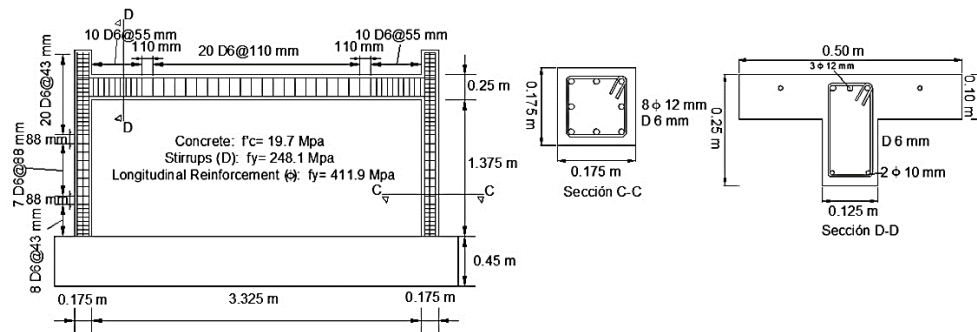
Reinforcing details and dimensions of frame corresponding to three story building
